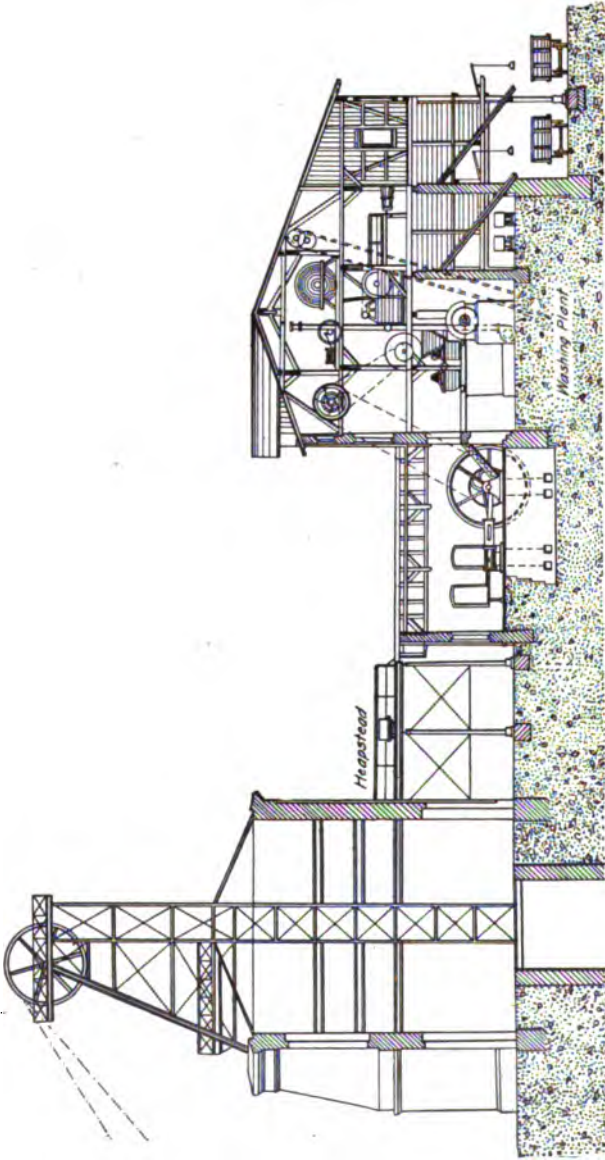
SECTIONAL VIEW OF LOHRIG WASHER AND SHAFT-HEAD FRAME AT DOWLAIS
